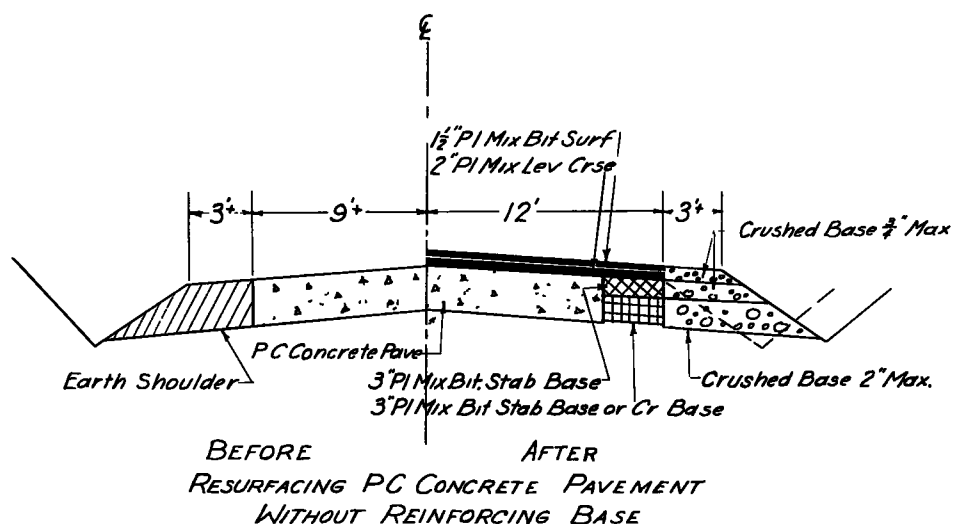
Widening and resurfacing portland-cement concrete pavement.
